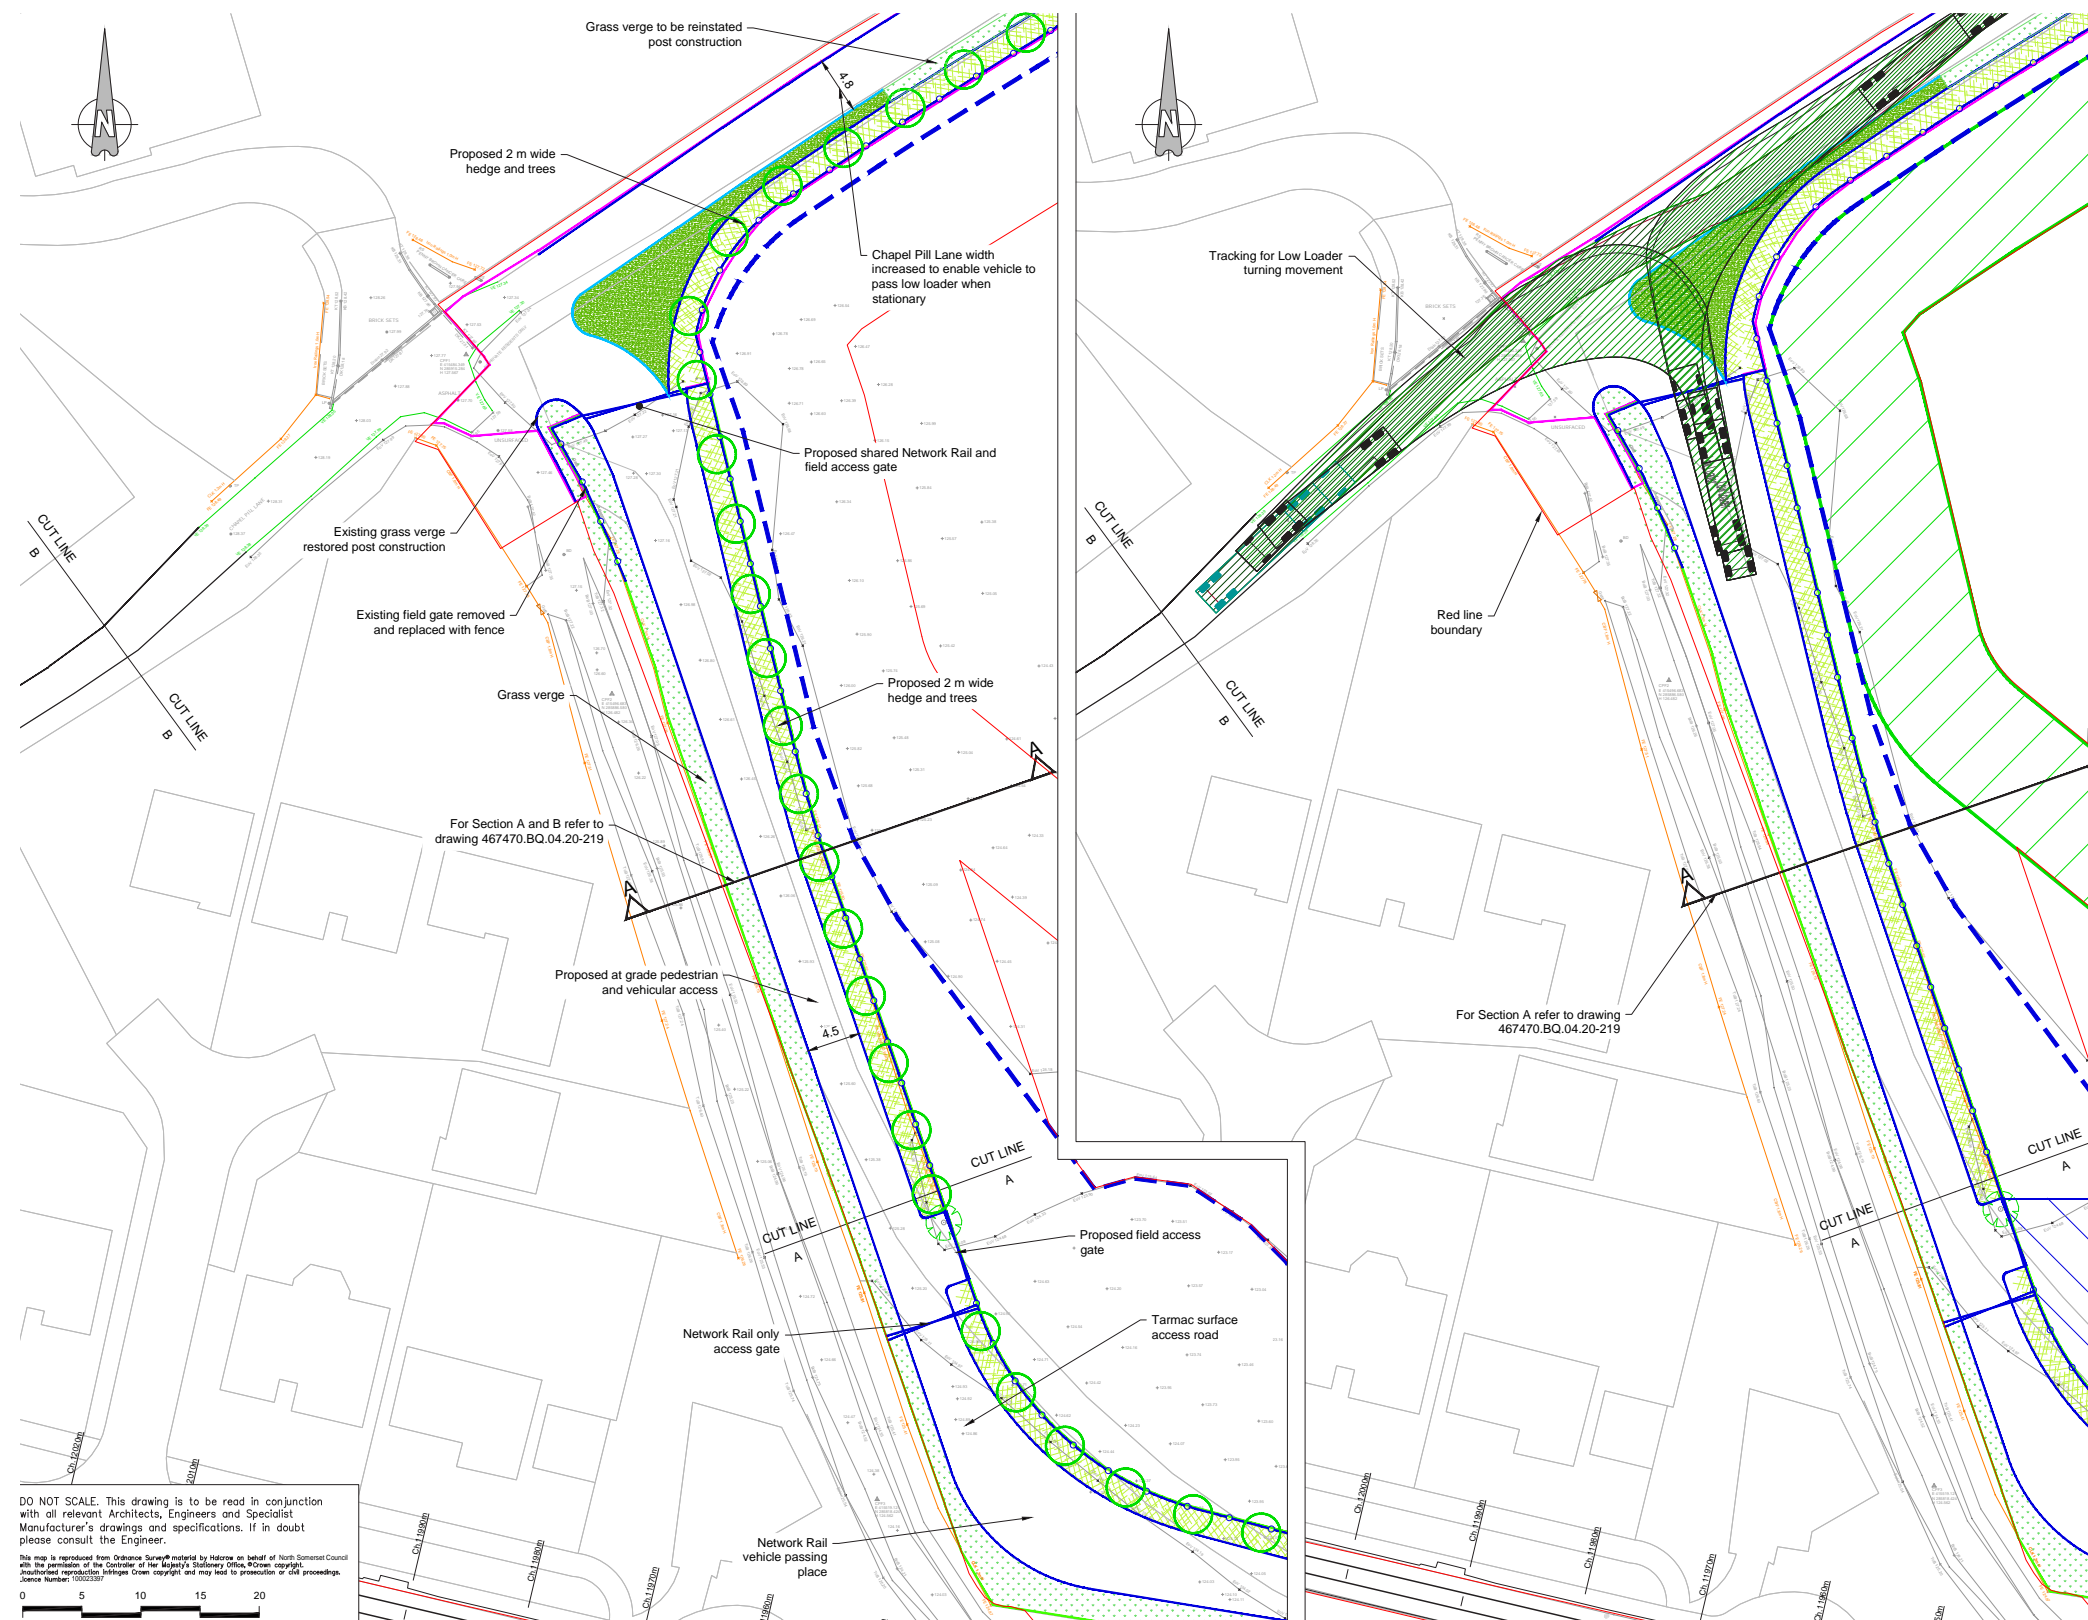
Pill Tunnel Eastern Portal proposal (467470.BQ.04.20-221)
